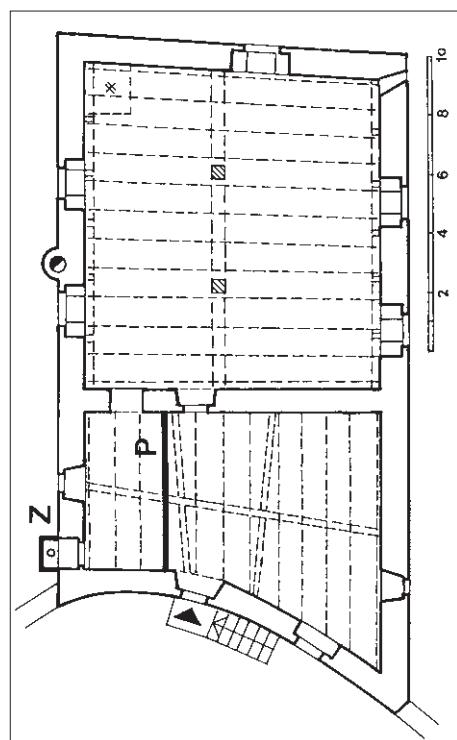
SLUNJ CASTLE, NORTHWEST CORNER OF THE CASTLE'S NUCLEUS, TI BEAMS ON THE CORNER (SCHEME)
